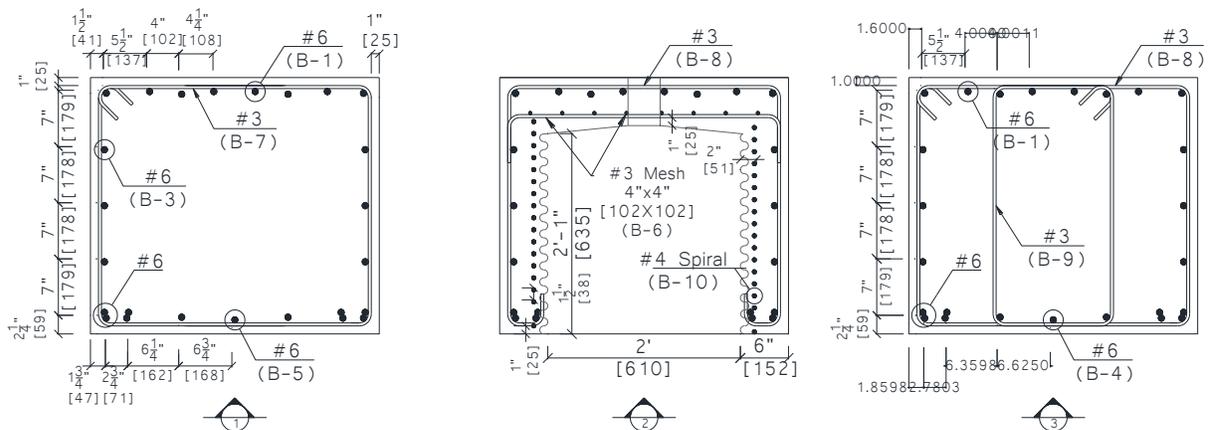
Cap Beam Pocket Connections (Restrepo et al., 2011)
